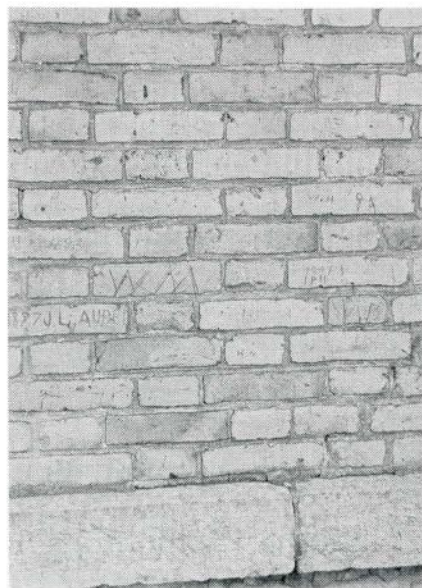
Flemish bond, west wall of church at Moulinette, erected before 1871.
